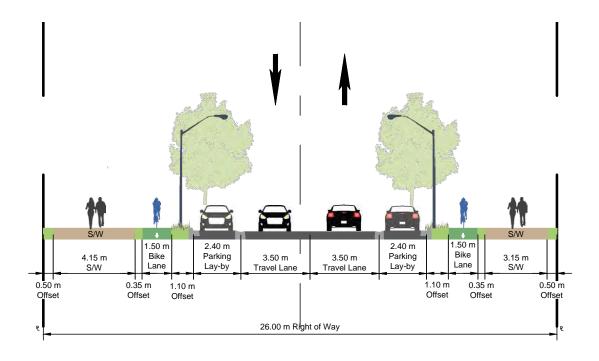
Cross-section through Davis Road prepared by BA Group
